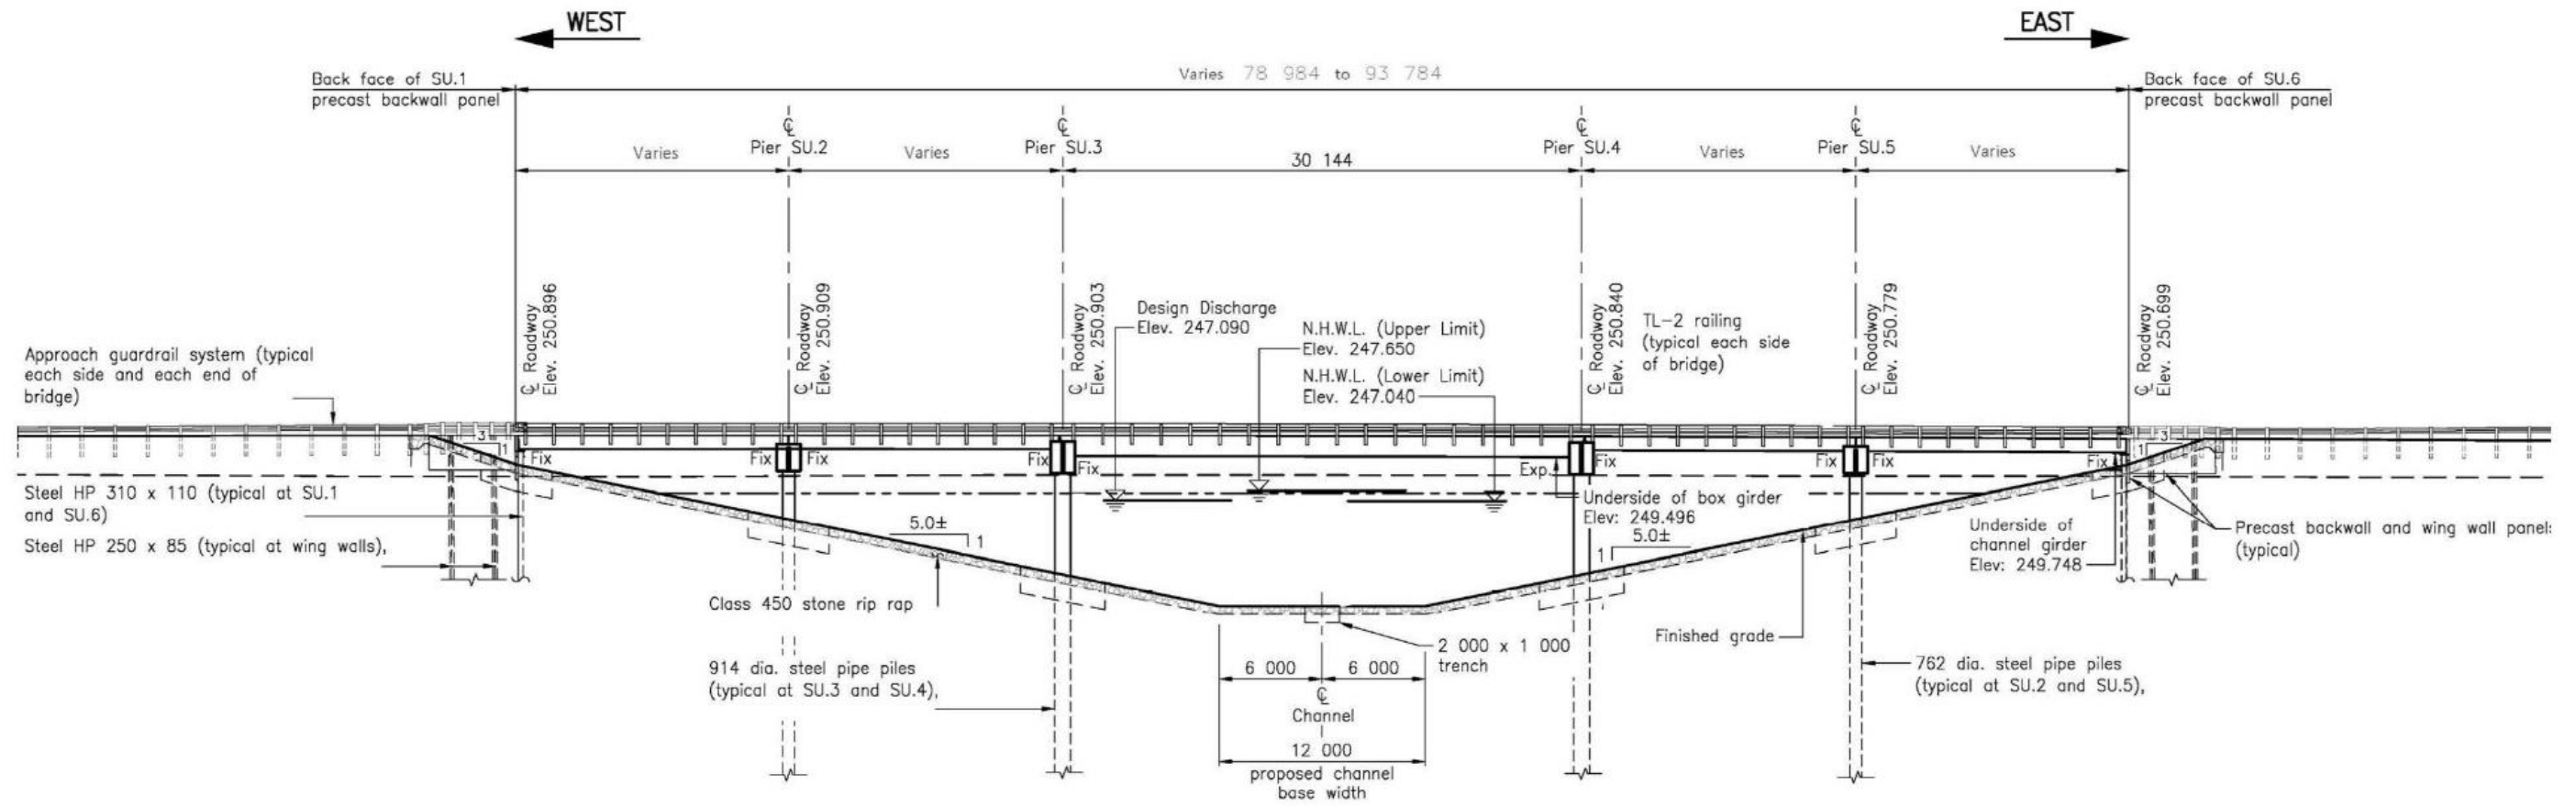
C-12a LMOE Typical Bridge Elevations and Cross-Sections – PTH 6 Bridge
